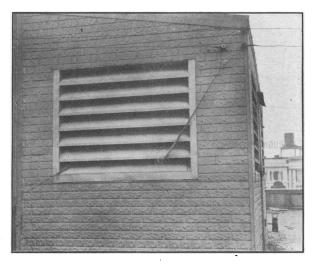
UNSCREENED LOUVER VENTILATOR IN ROOF OF ELEVATOR HOUSE.
